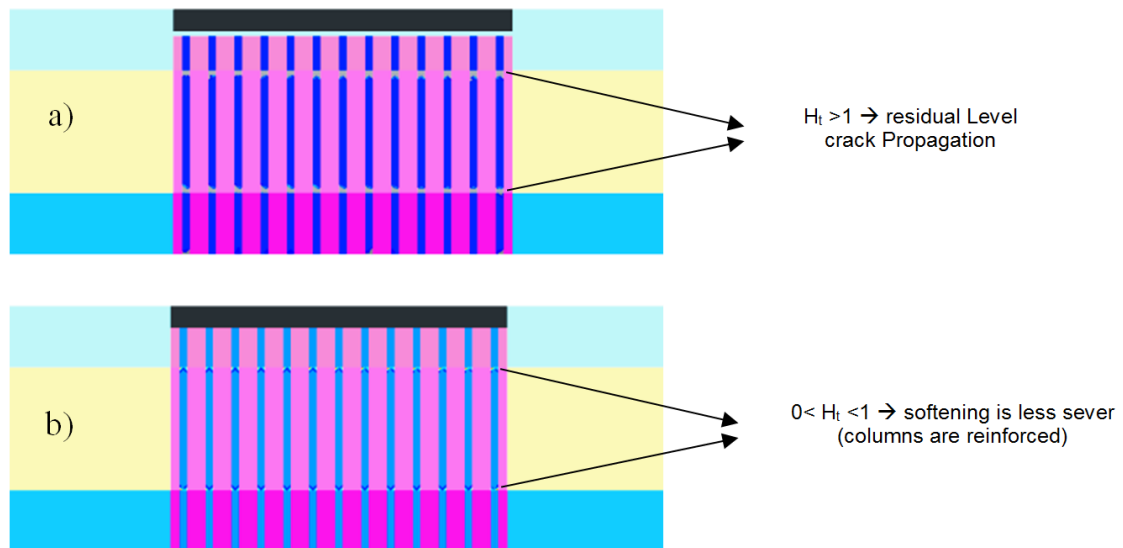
Crack propagation in the columns; a) transition layer, b) columns connected to the slab and reinforced
